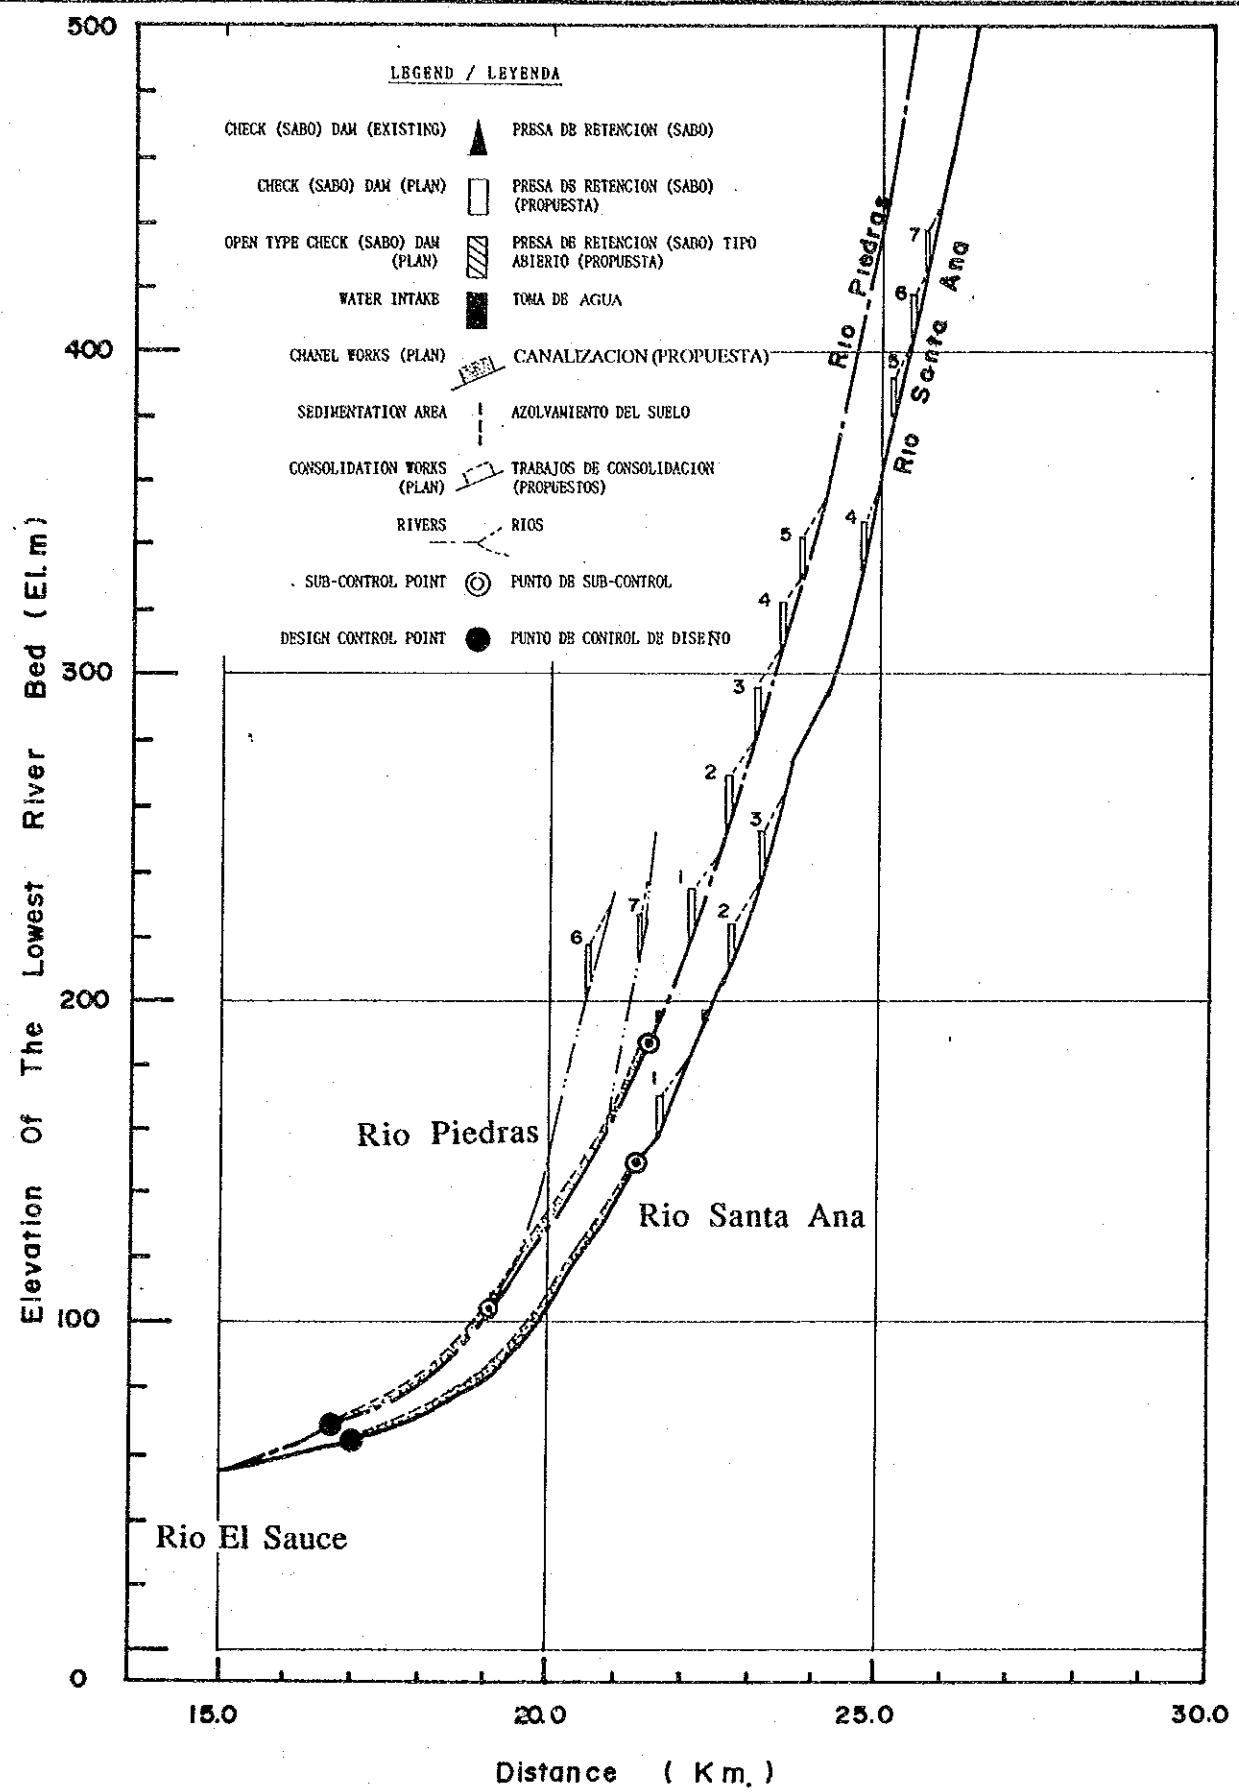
(3) LONGITUDINAL PROFILE OF EROSION CONTROL FACILITY ARRANGEMENT (RIO EL SAUCE)
